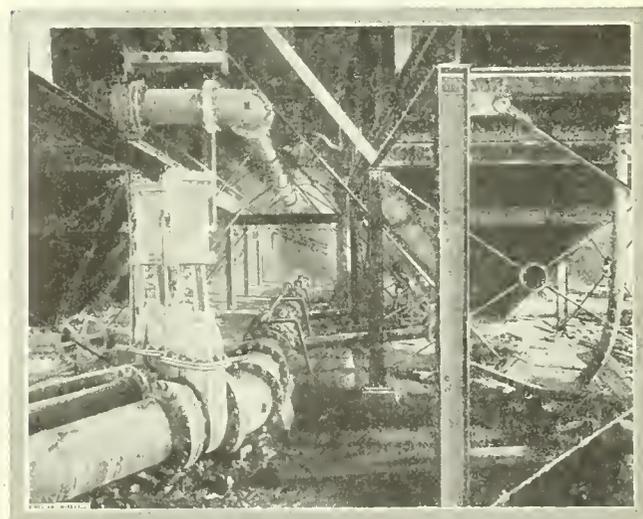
VALVE-OPERATING MECHANISM UNDER FILTER BOXES
